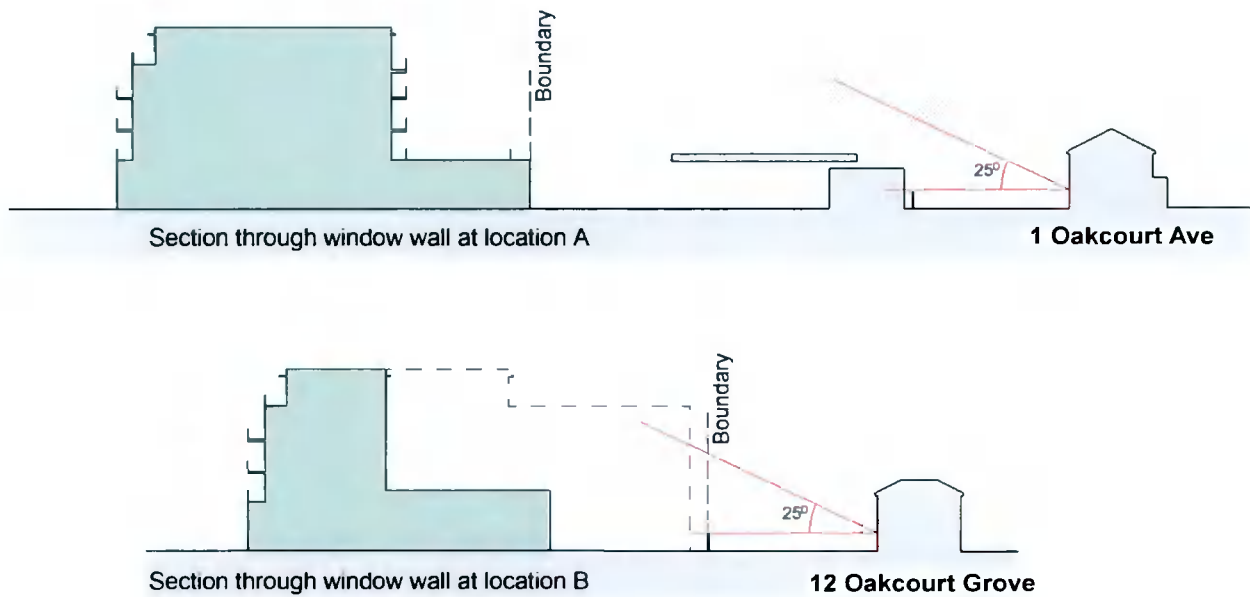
Section perpendicular to window wall at locations indicated in Figure 2.
